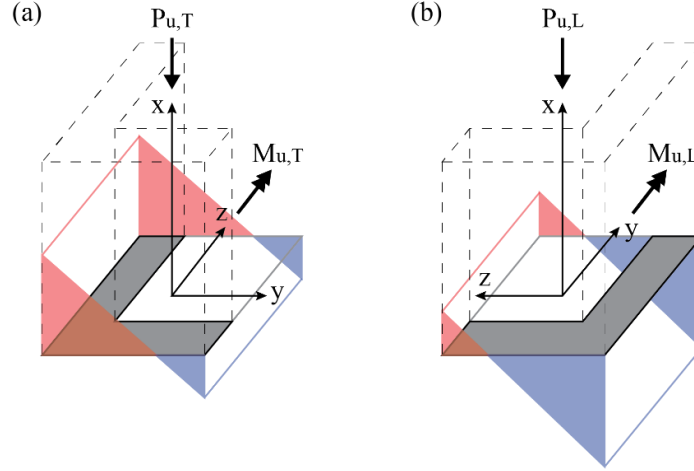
Nonlinear section analysis model of (a) the trailing wall and (b) the leading wall
